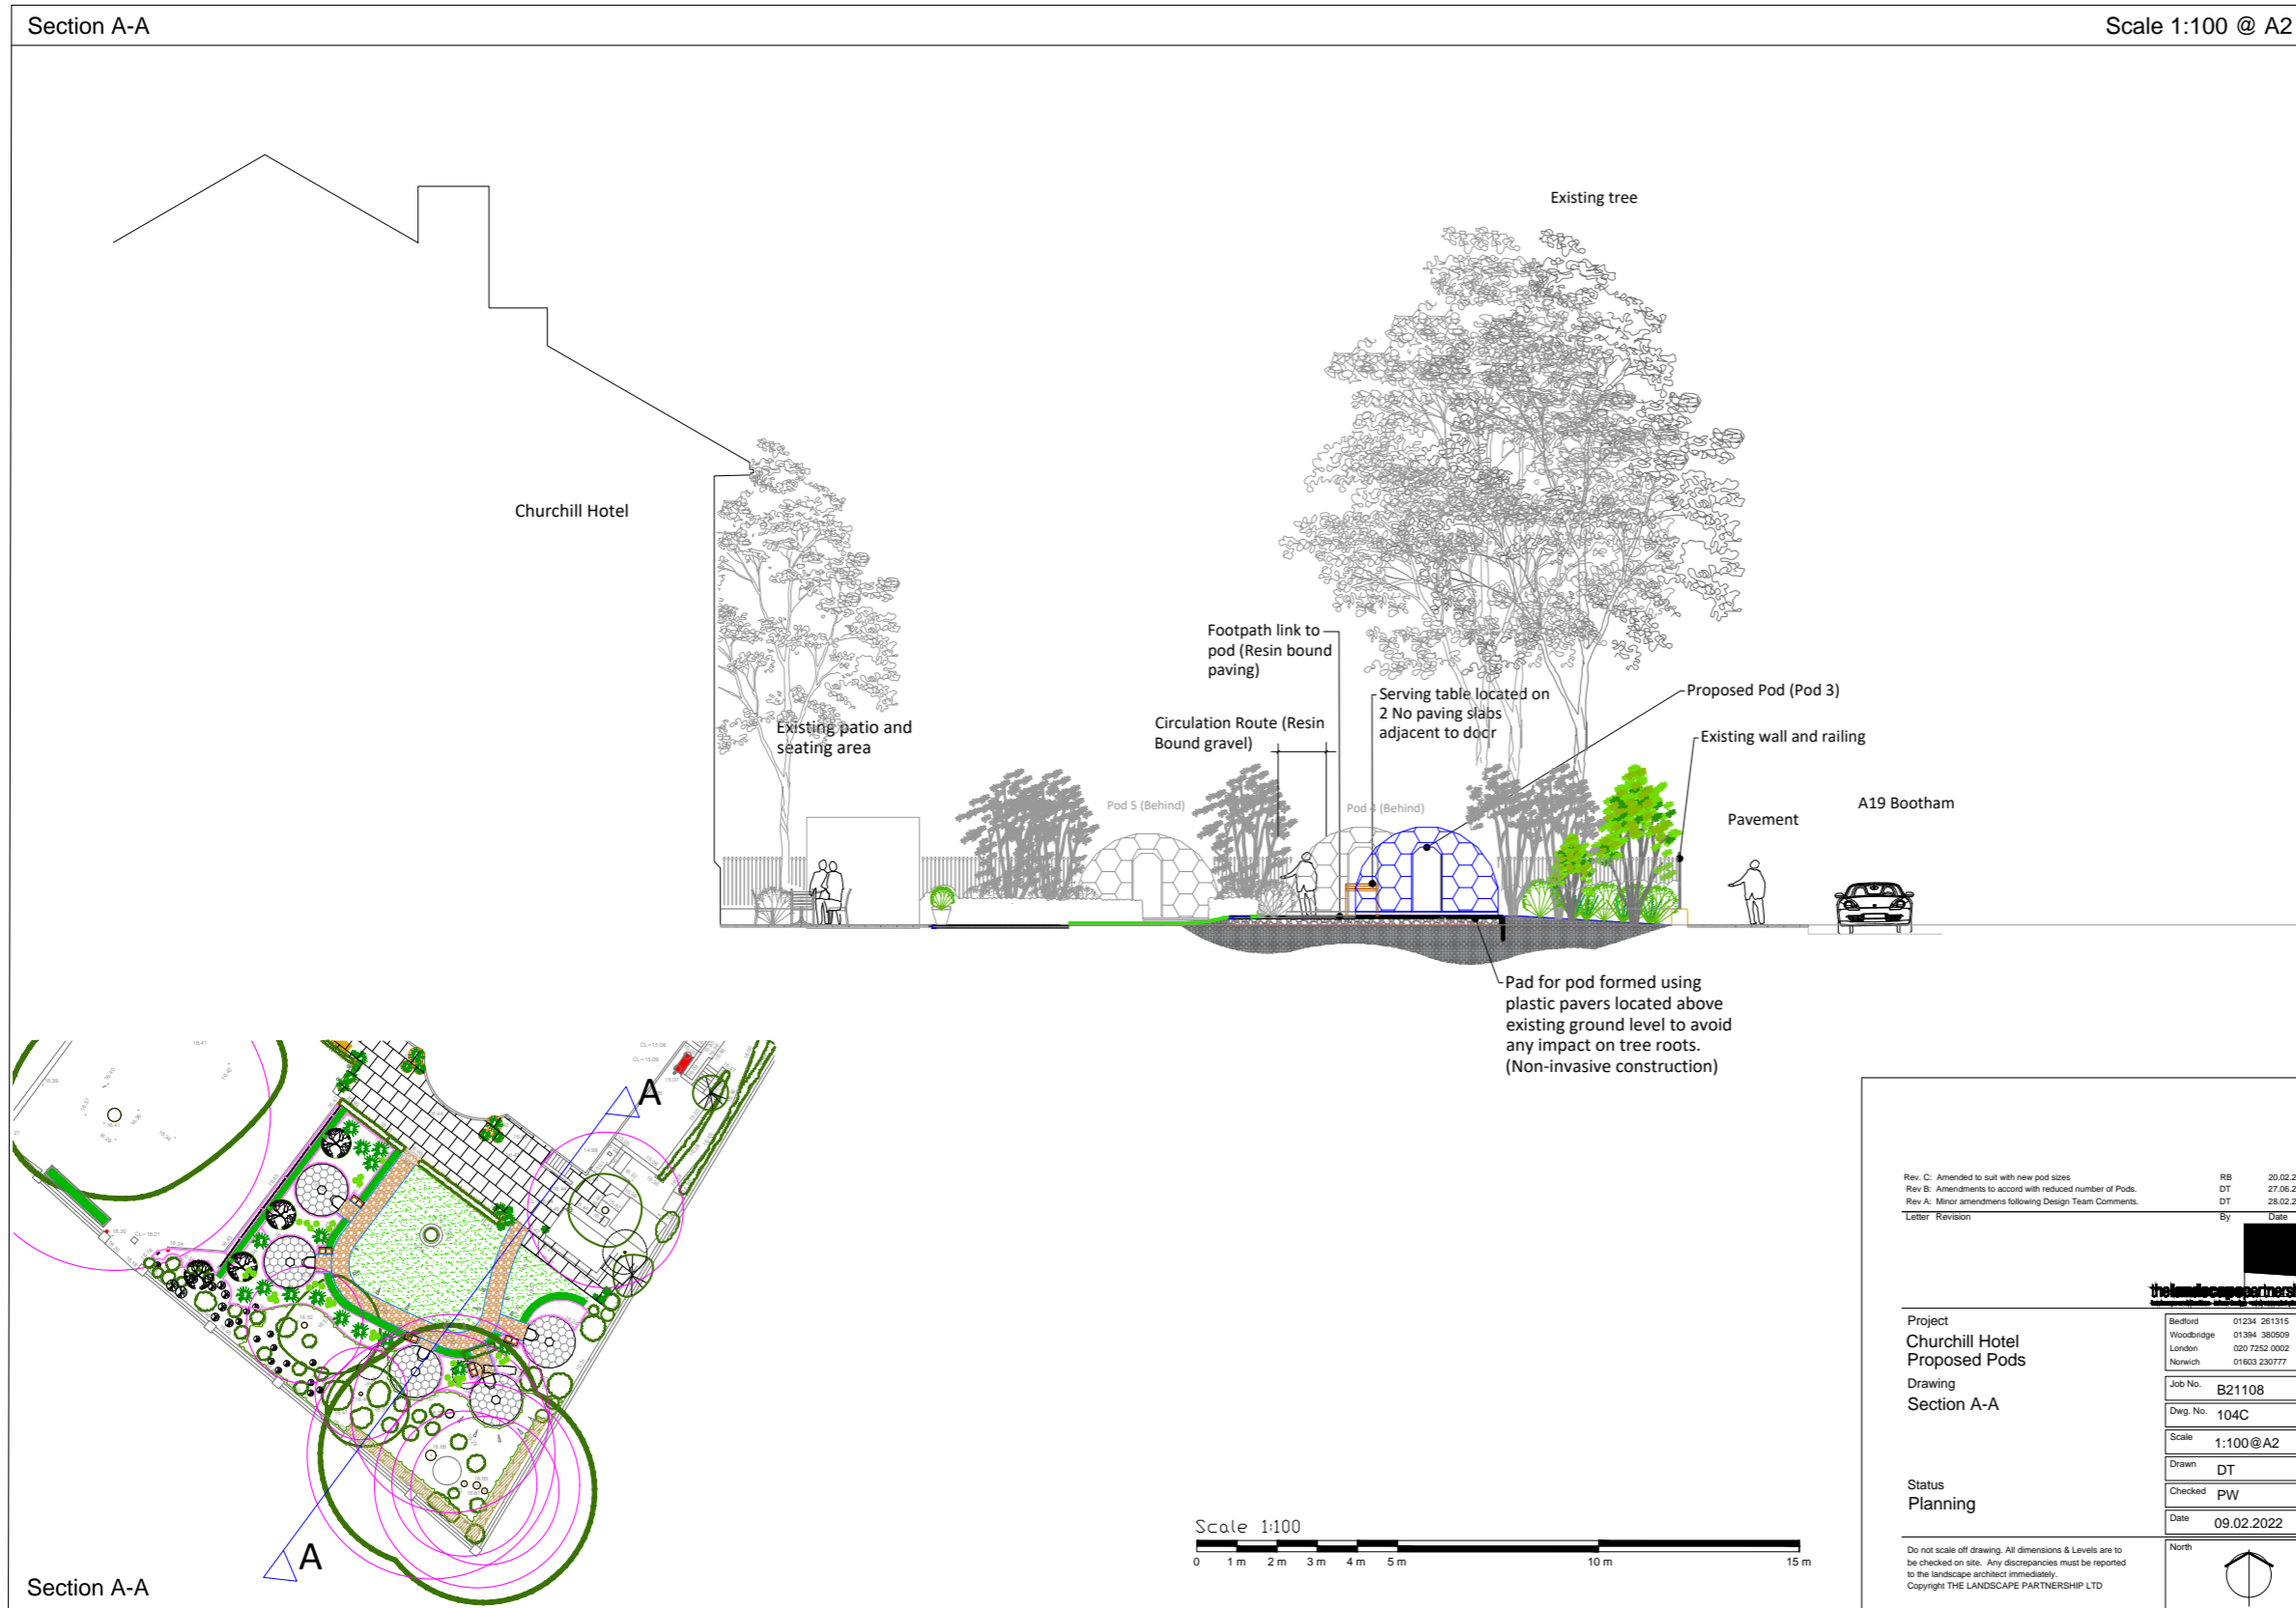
Section drawing showing proposed 5 pods (source: The Landscape Partnership Ltd)
